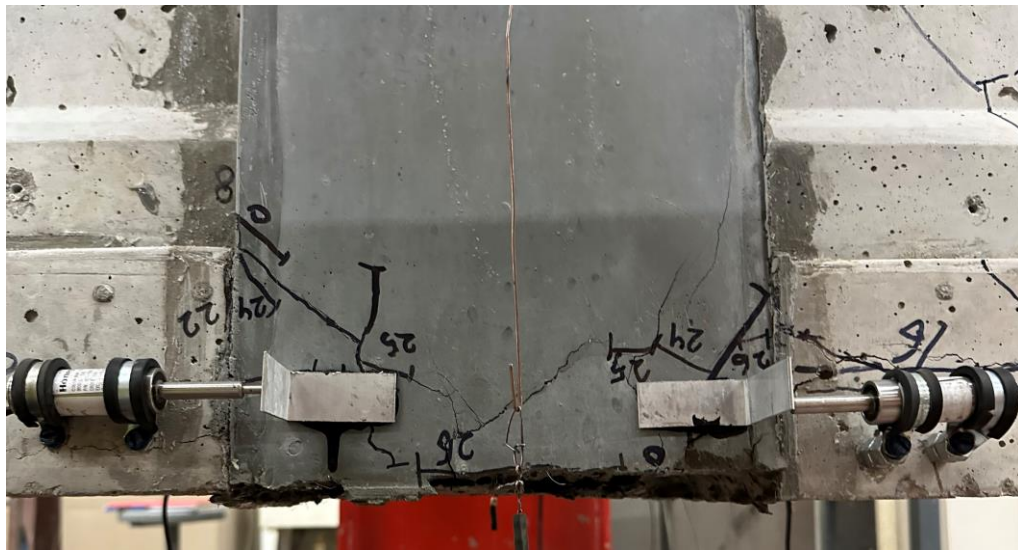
West side of joint SSDU-1 showing cracks near the as-cast top face of the joint under final negative moment test loading
